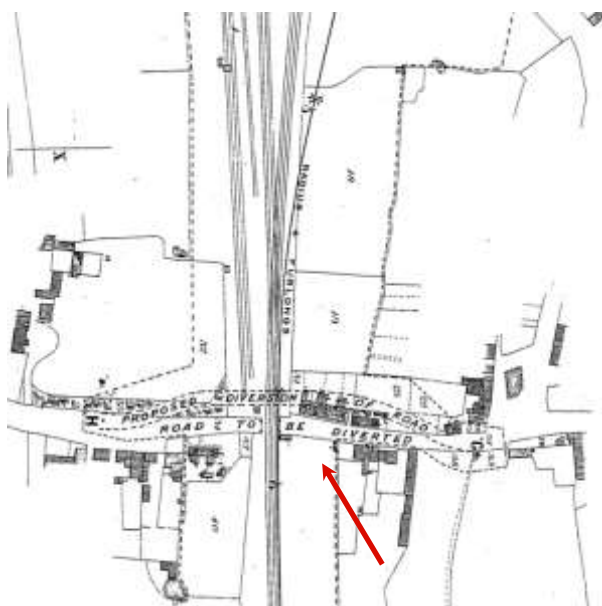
Pre 1884 plan for construction of bridge over the railway after accident over level crossing. Arrow marks test pit position
